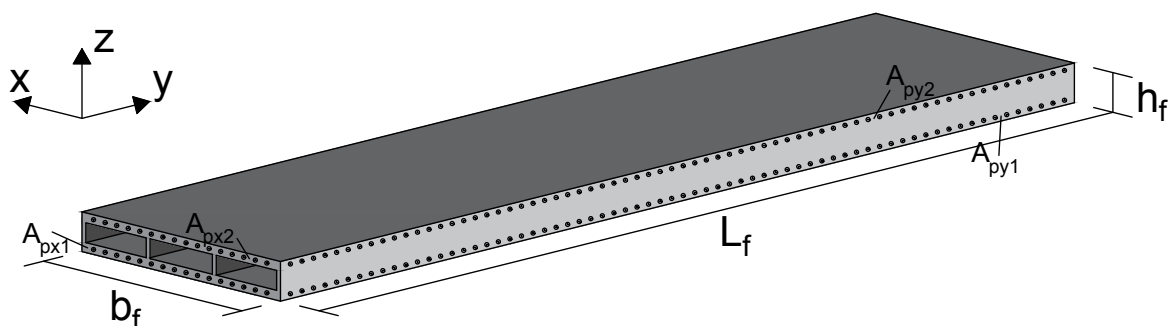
Open floor girders with the prestressing cables indicated (not to scale)
